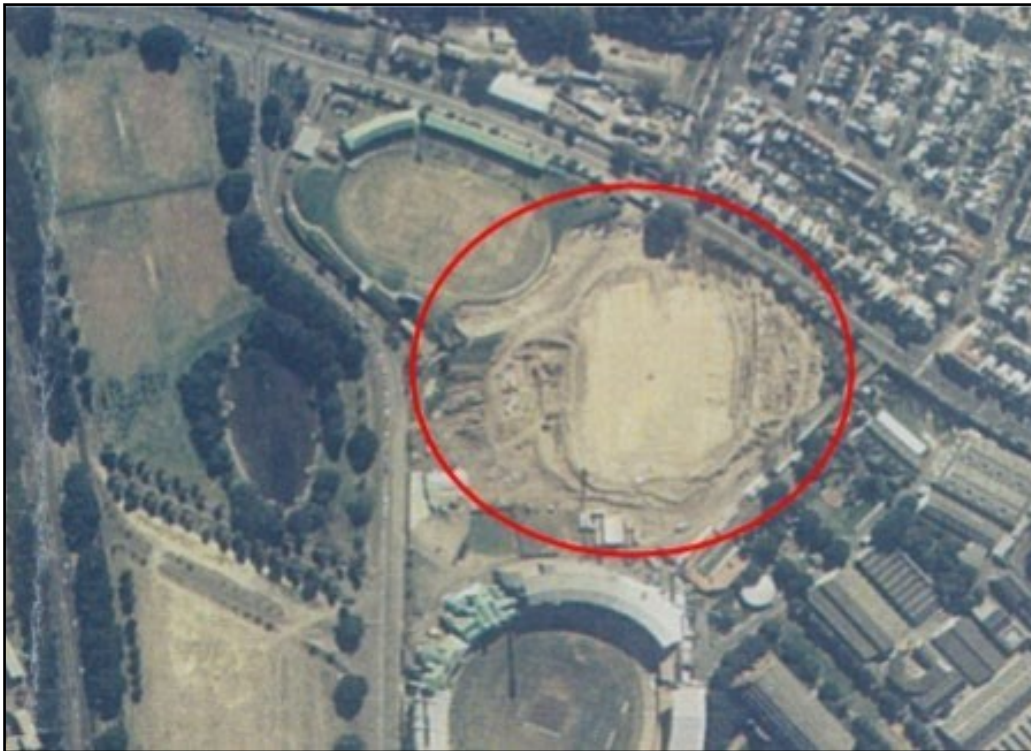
Added detail of excavation and battering visible in 1978 aerial (Douglas Partners 2019)
